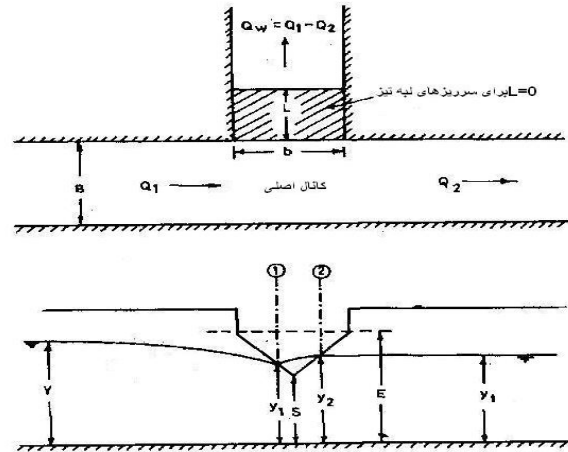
Plan and longitudinal section of triangular side weir at rectangular canal.
